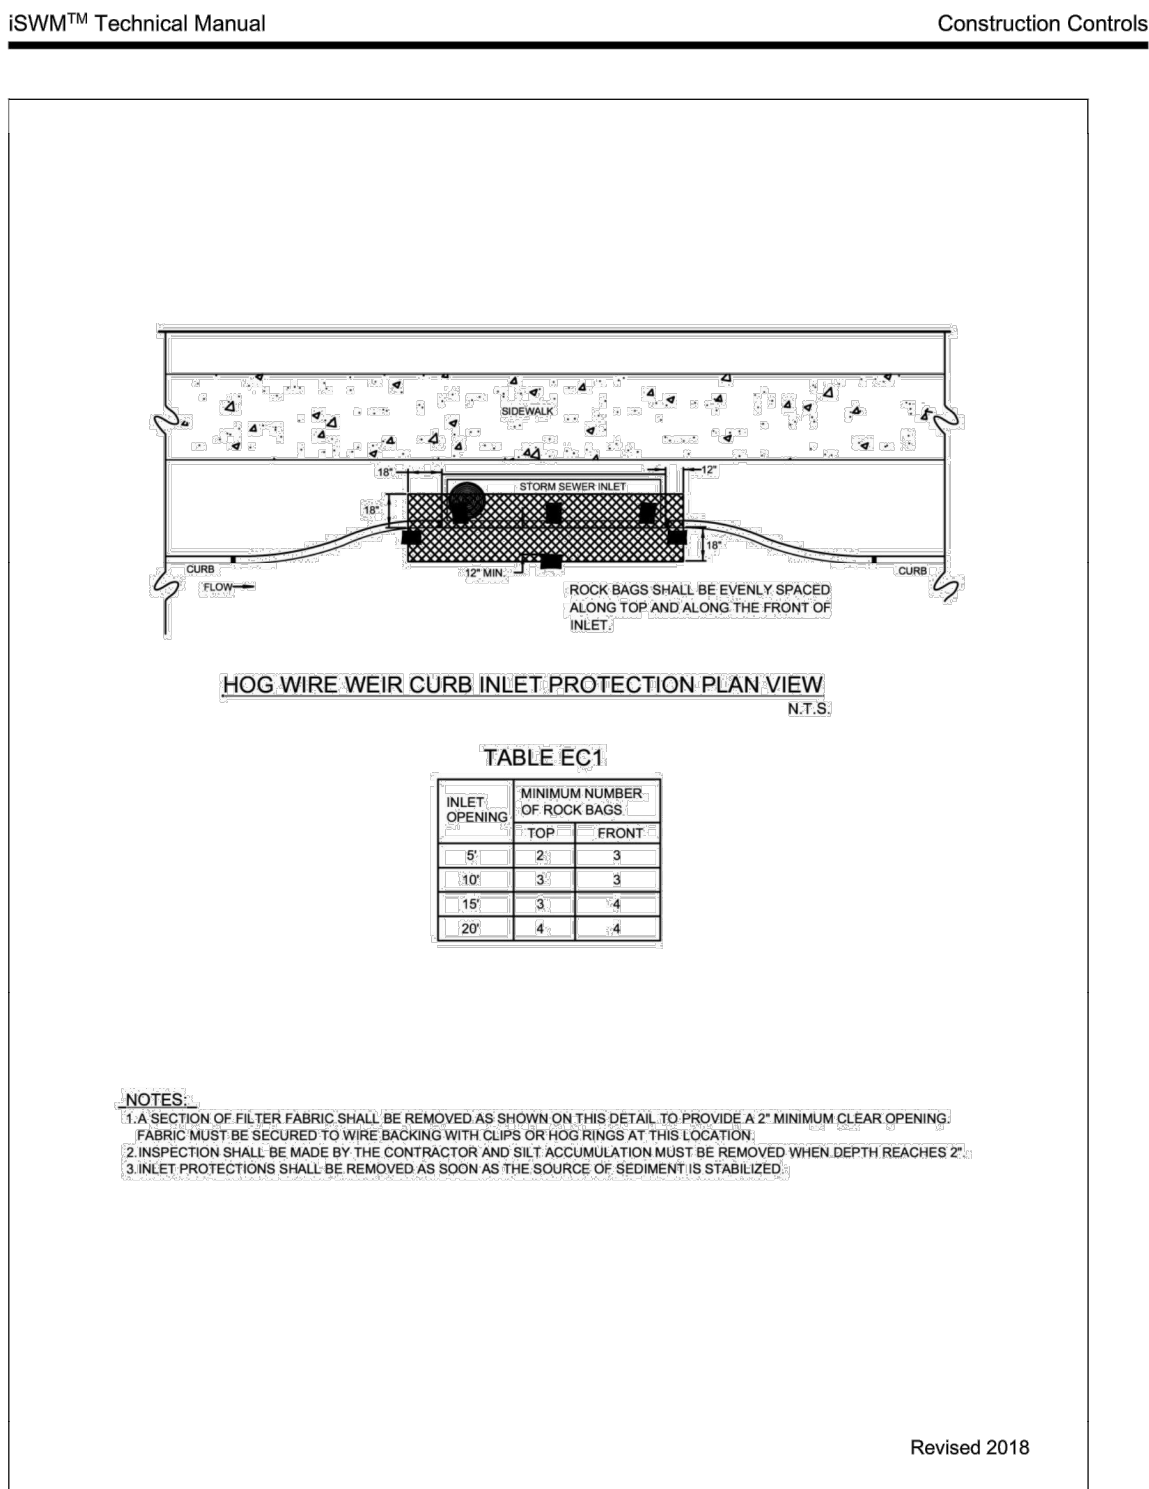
Hog Wire Weir Curb Inlet Protection
